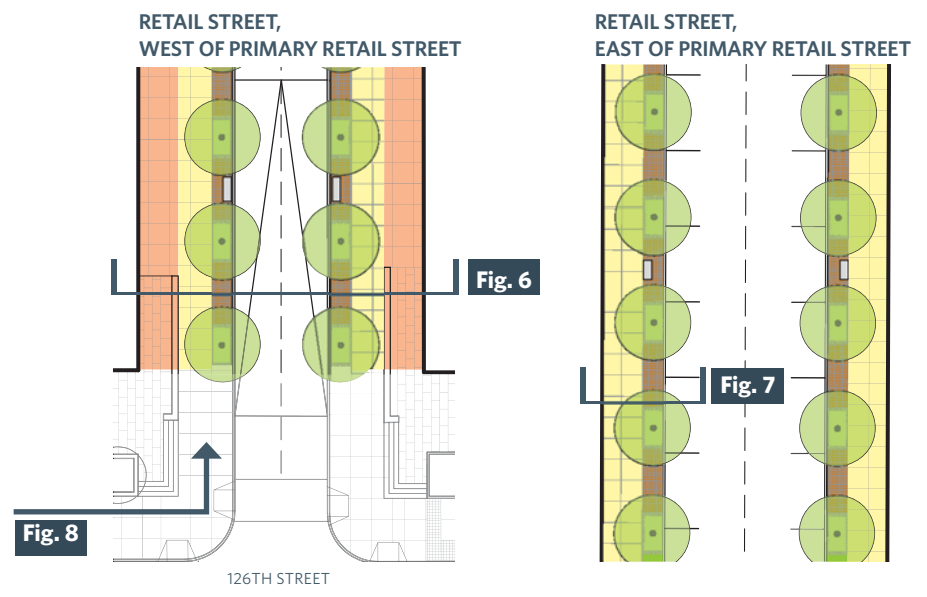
Typical plan and section of the Retail Street, west of Primary Retail Street
